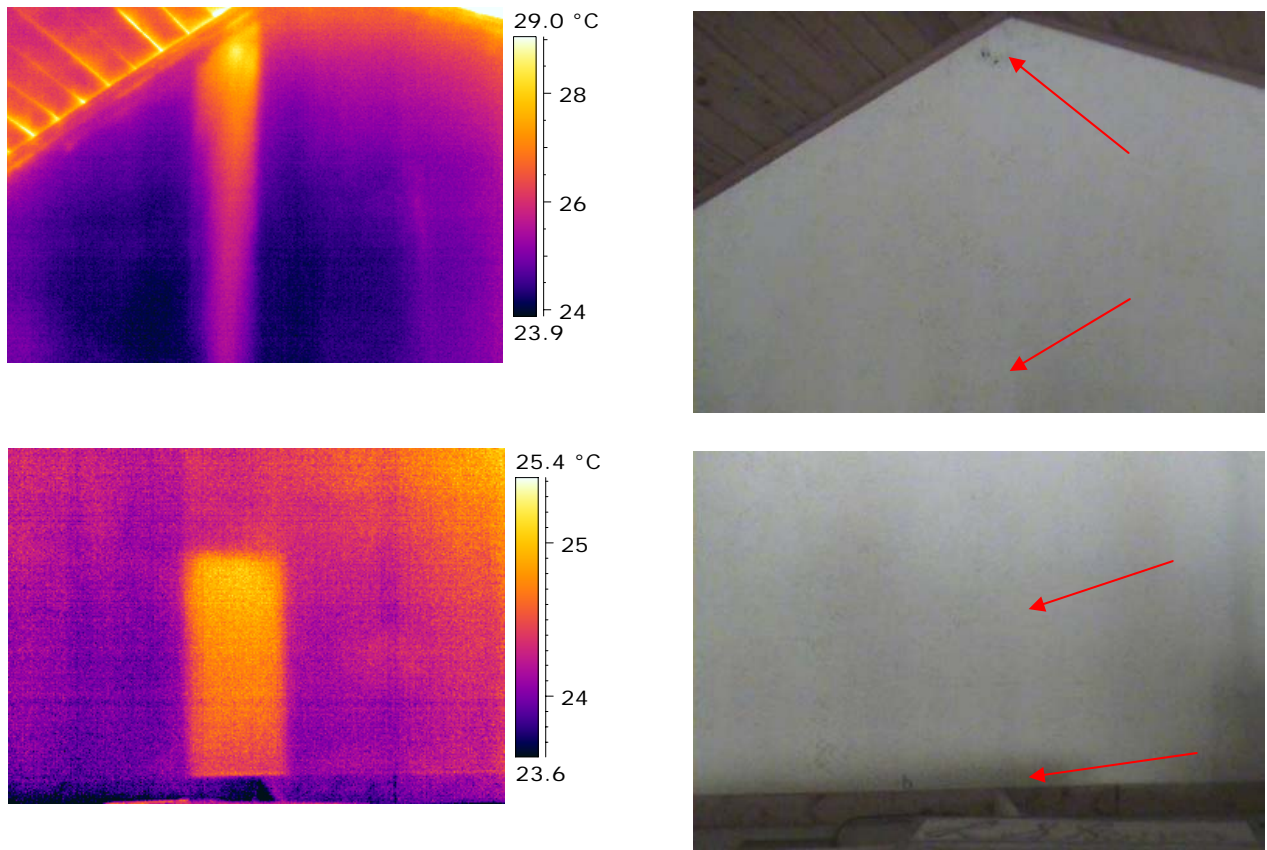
Top IR image and photo show the area of the north wall just west of the peak. Bottom IR image and photo show the north wall along the east edge of the wall. Warmer wall areas indicate missing/damaged insulation.
